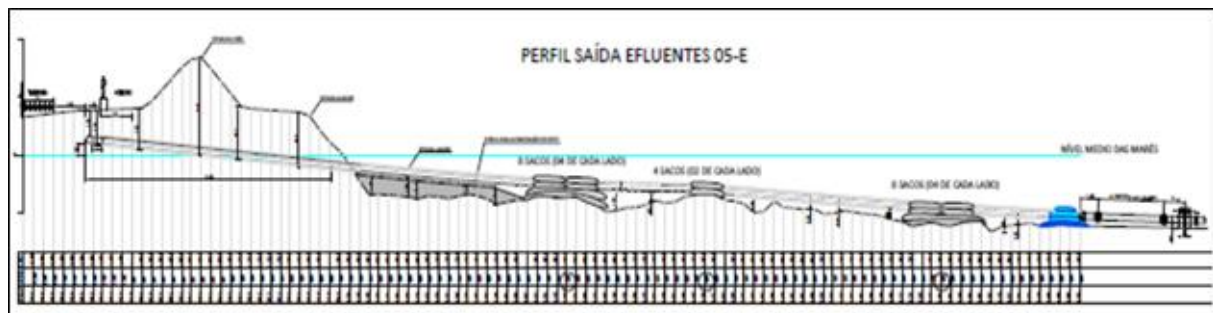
RNEST – Shore Approach – Submarine outflow pipeline layout.
